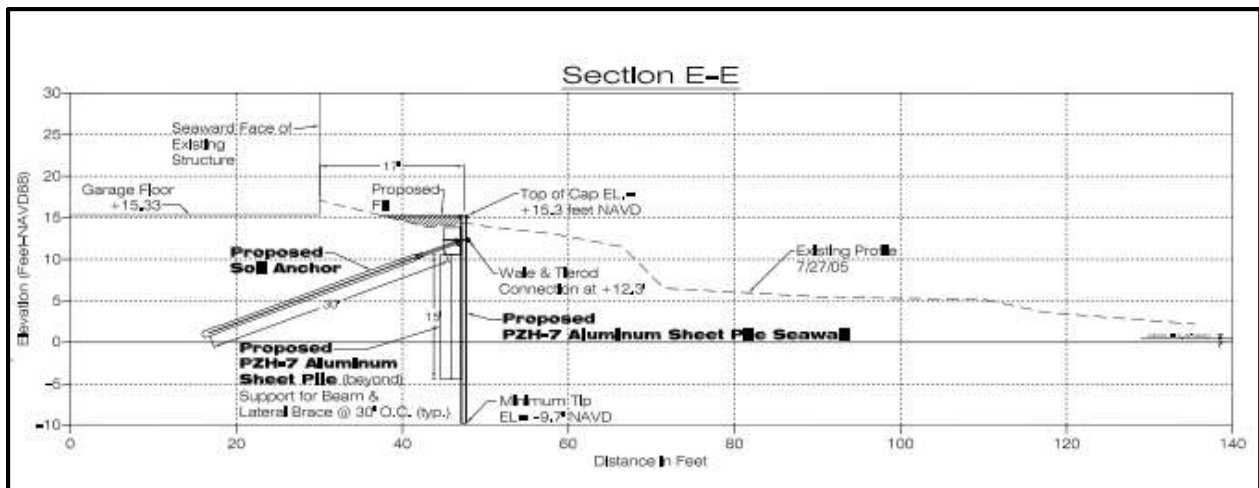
Typical Cross-Section: Seawall with Soil Anchor
